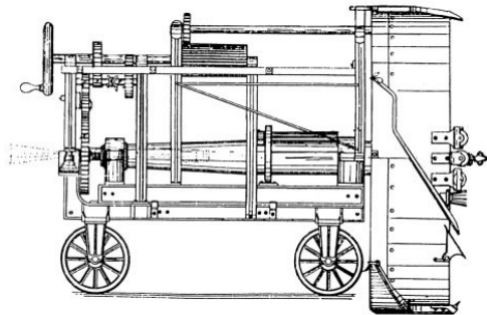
Wilson's improved machine. Built in 1857. Adapted from [2].
